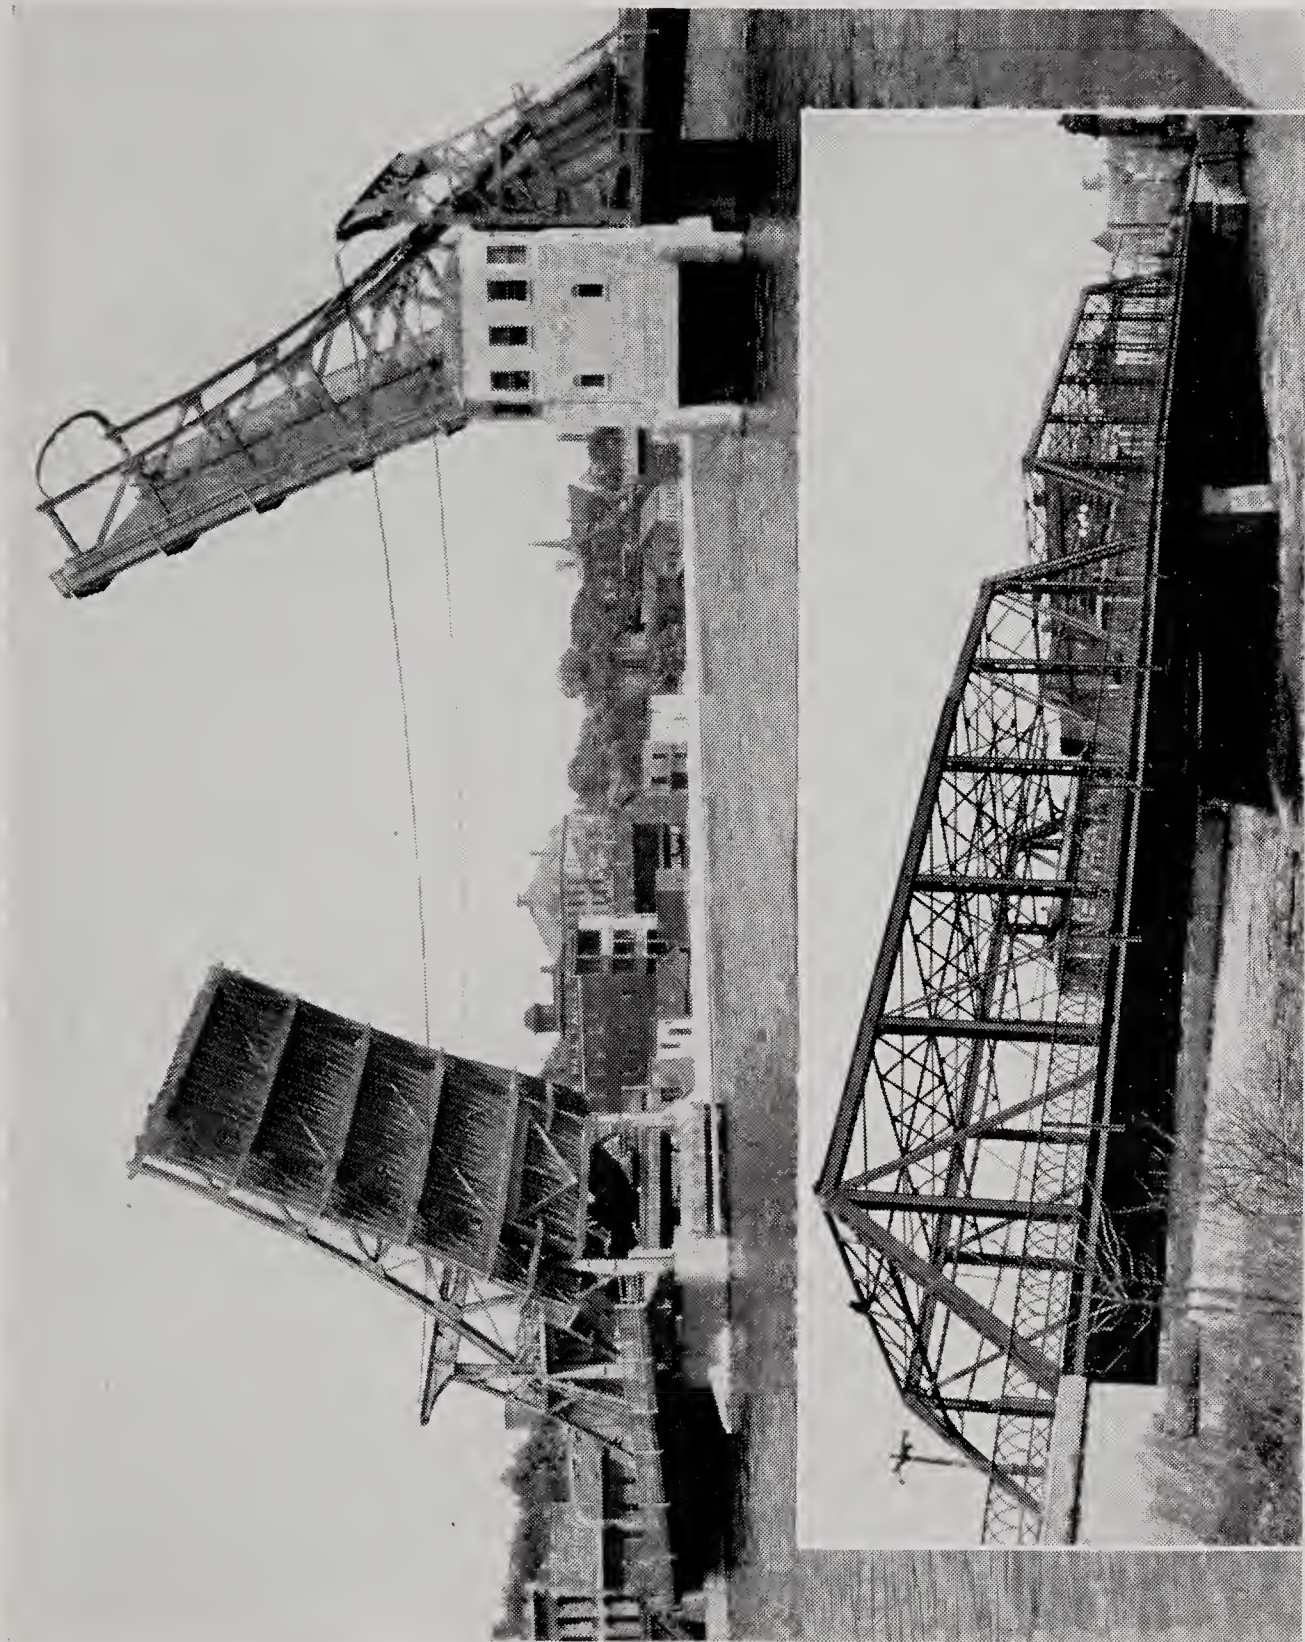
View showing the old and new Jefferson Street Bridge at Joliet.
